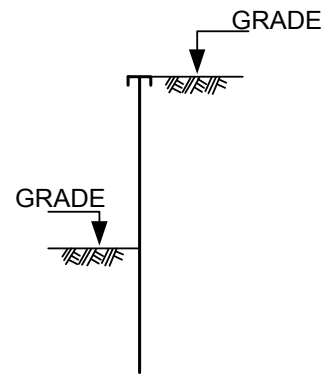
(a) Typical Gravity Retaining Walls (cont'd)
